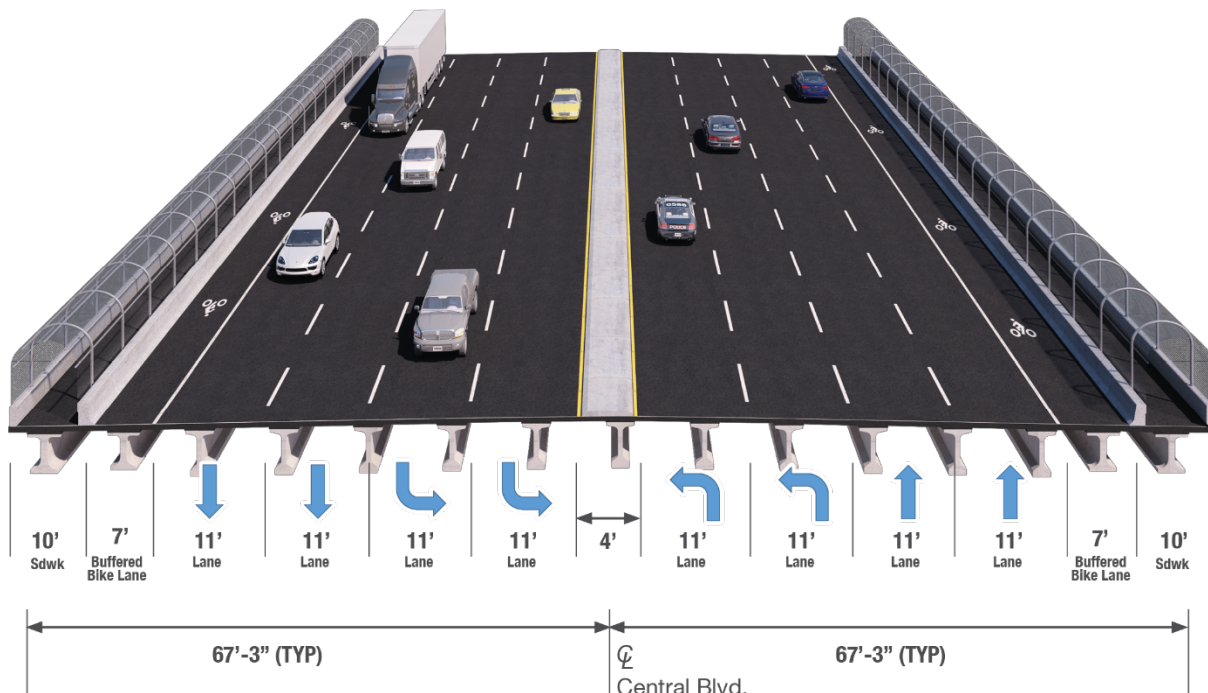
Proposed Typical Section - Central Blvd. East of I-95 – TDUI
